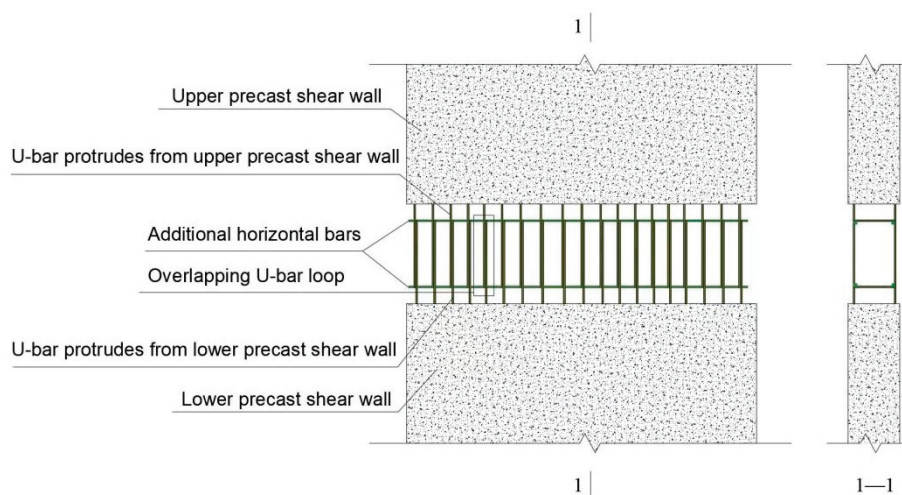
Technical diagram of the buckle connection of ring reinforcement.
